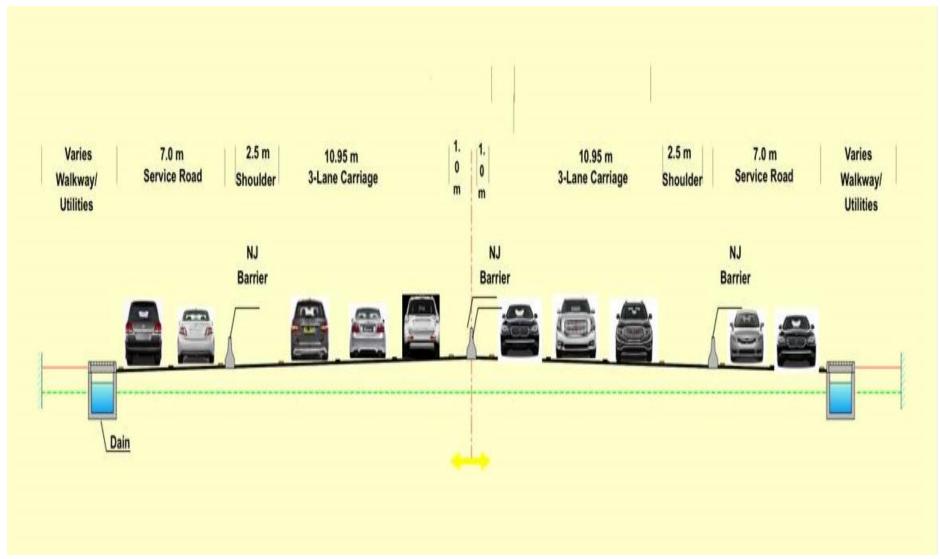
Typical Cross Section of the 3 Lane Road with Service Road
